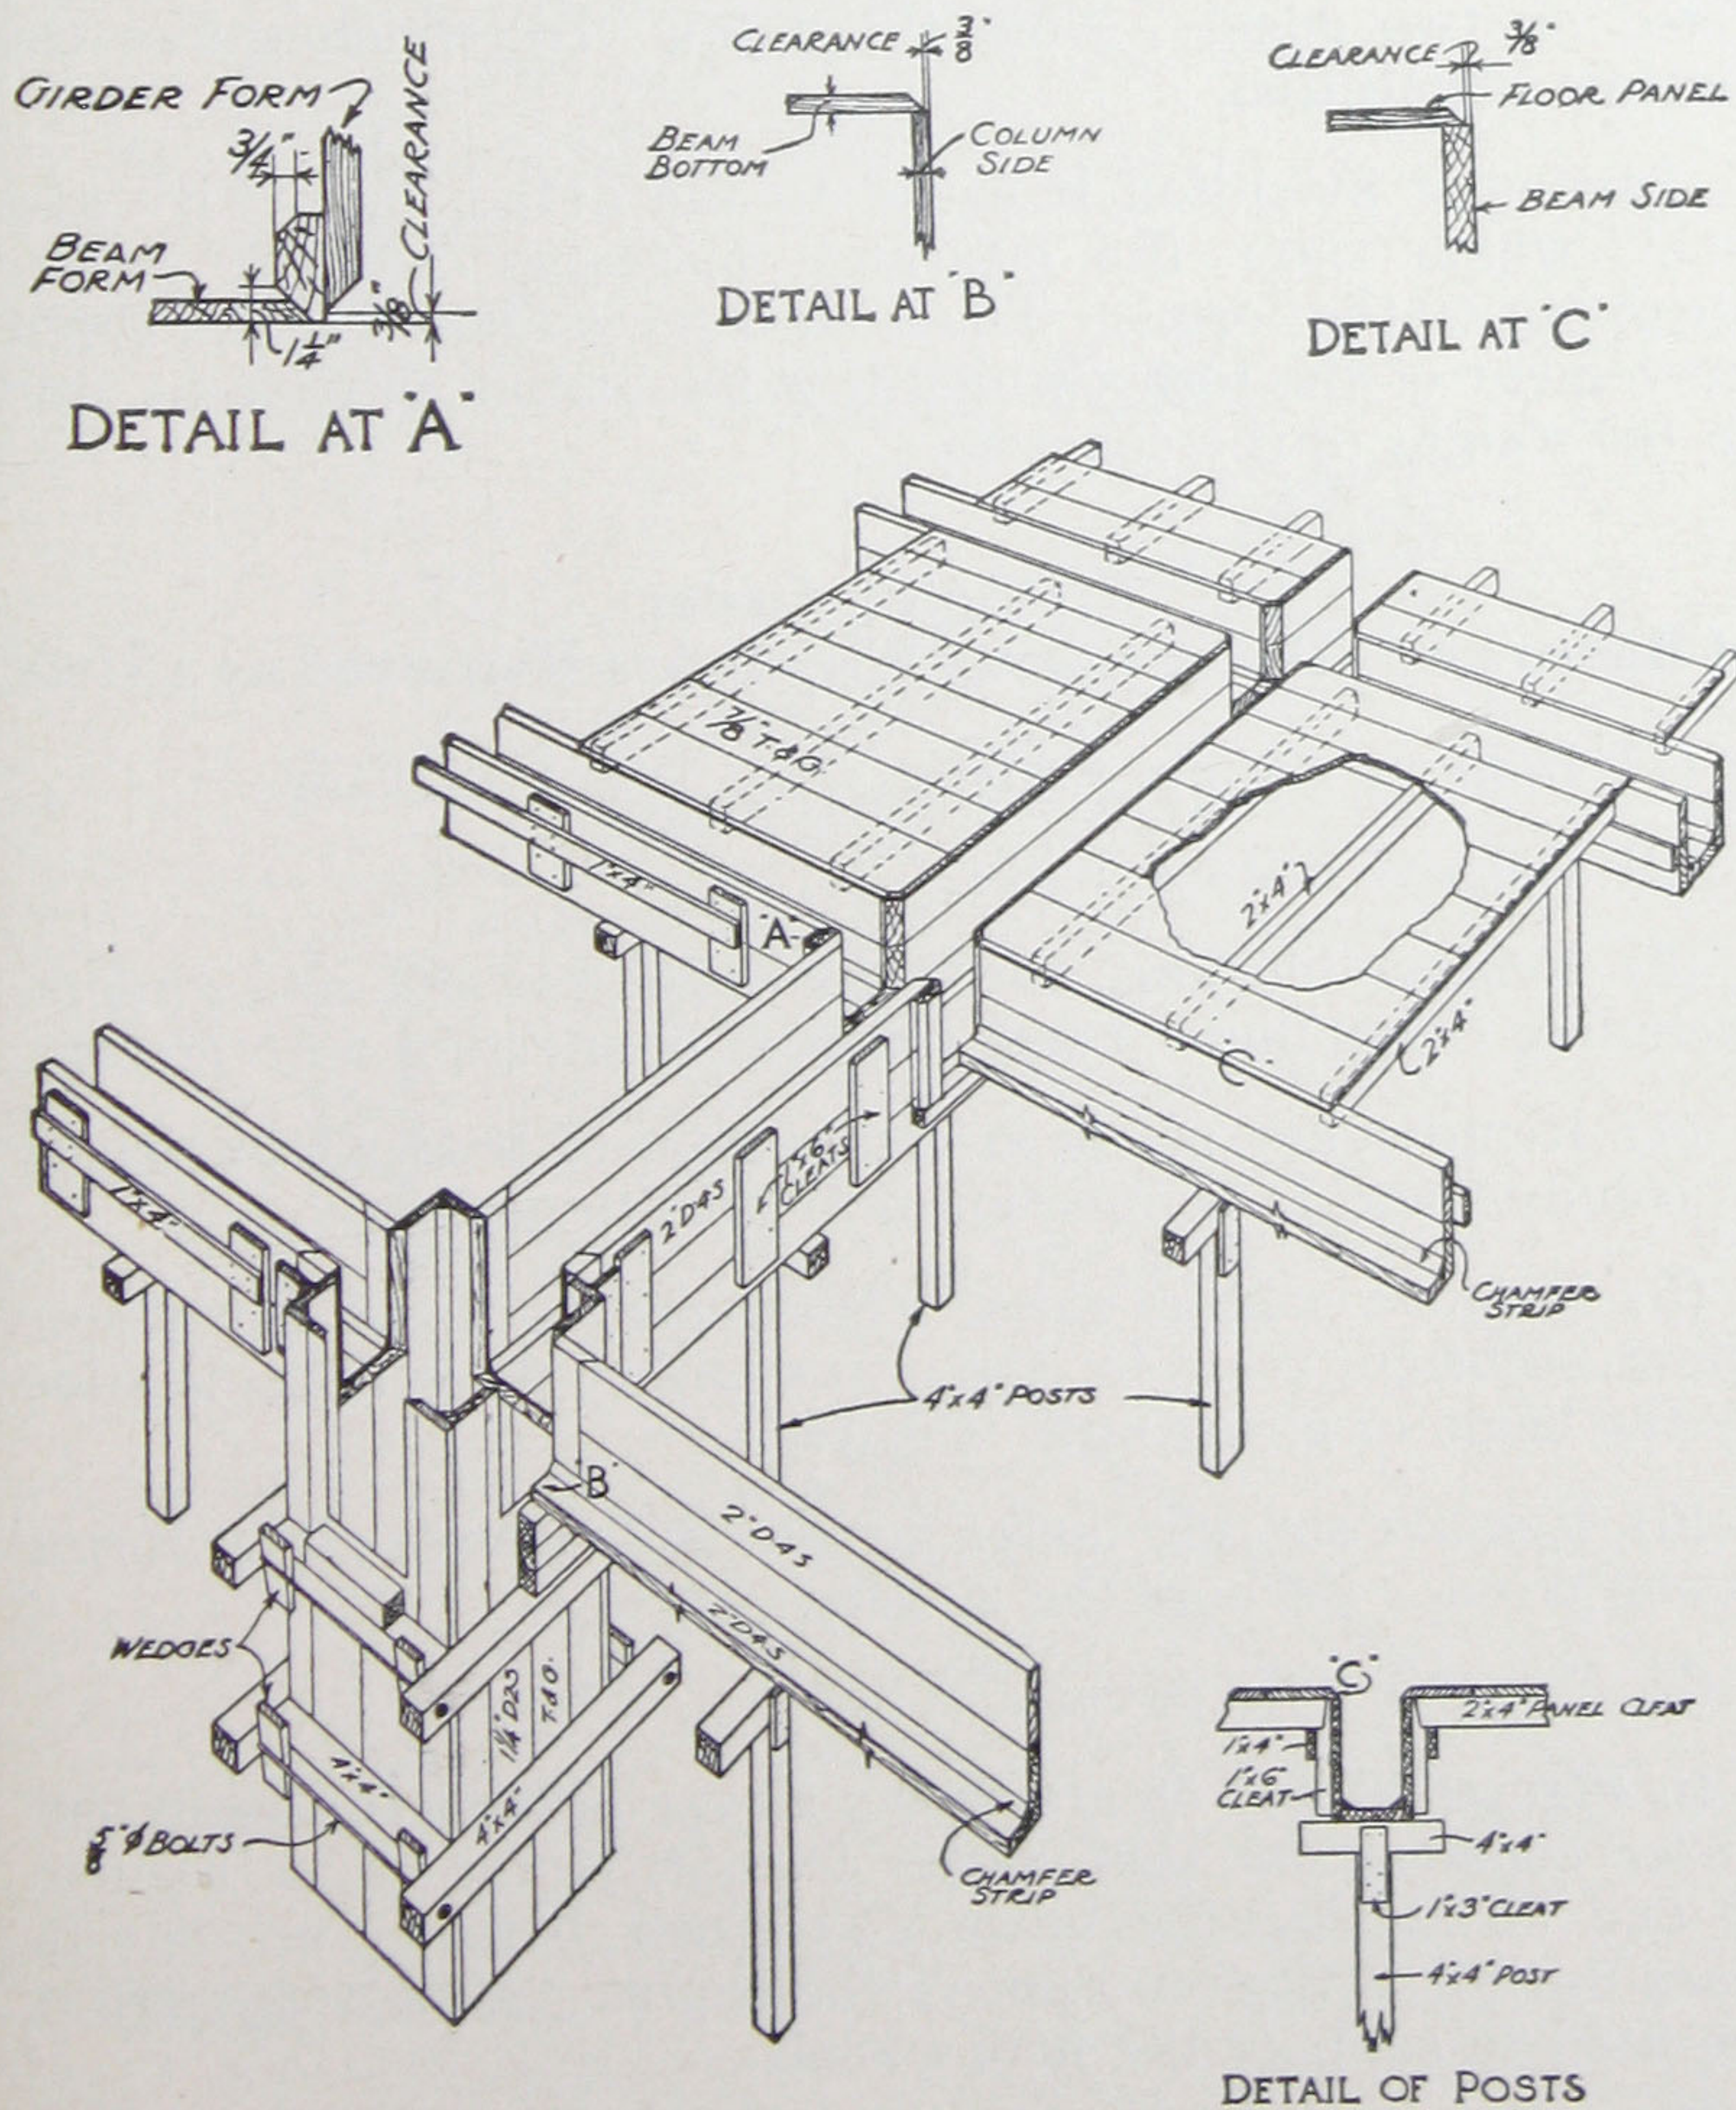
Forms for beam and girder floor system, showing forms which are to be completely removed as one unit.
